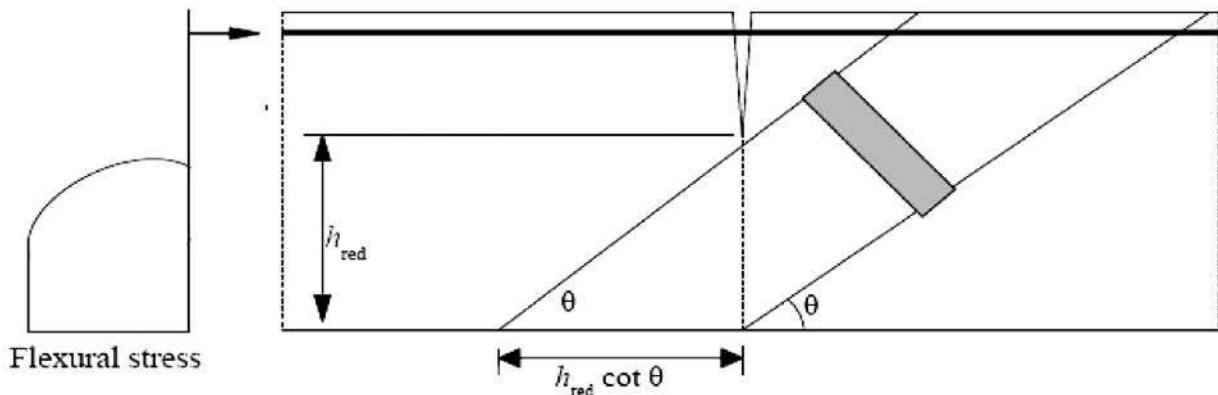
Diagonal Stress Fields Across the Joint in the Web of Segmental Construction
